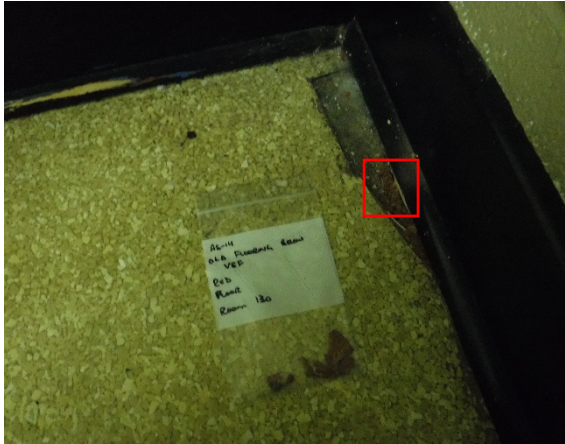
Photo of sample AS-14, Room 130, Floor – Flooring Material below VSF, 6.4% Chrysotile Asbestos.
